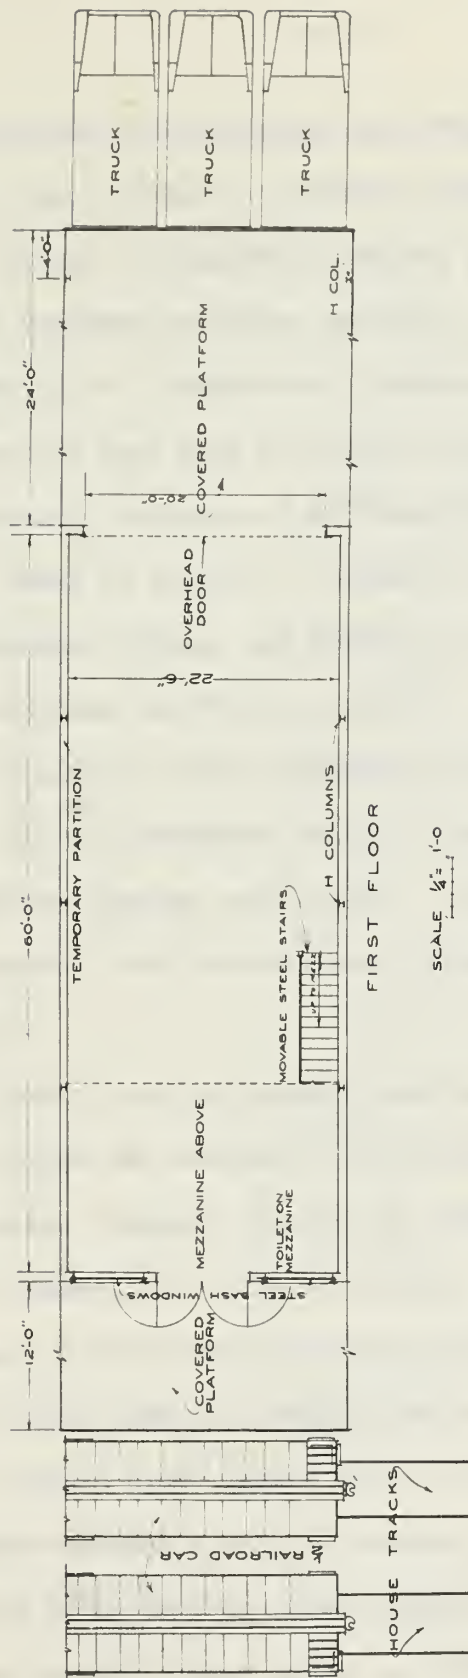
suggested floor plan for a wholesale fruit and vegetable store, 22½ by 60 feet.
